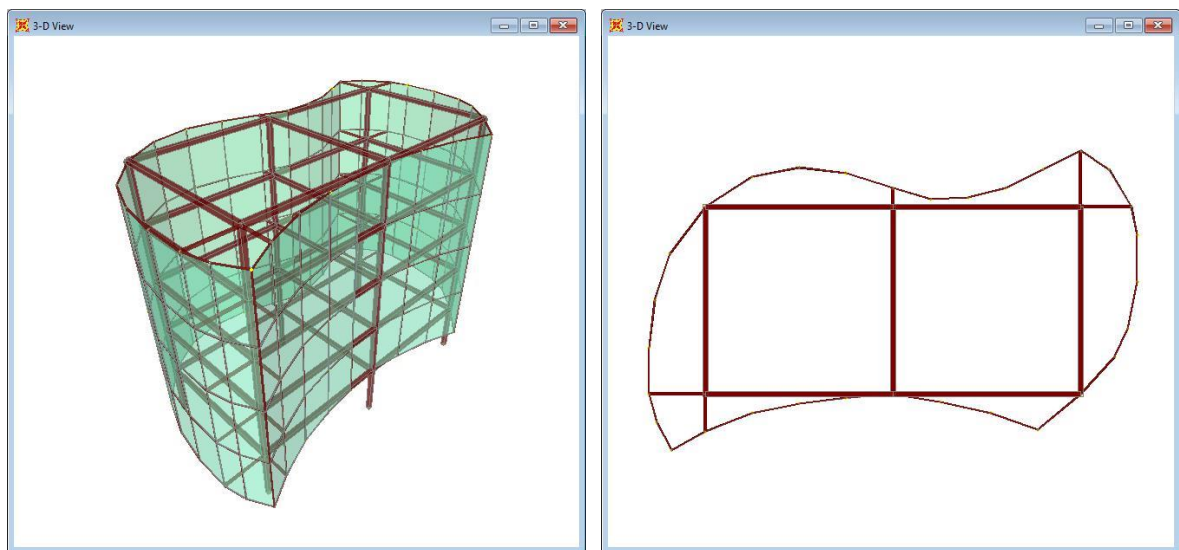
Numerical model of S-shaped (Sinuous shape) curtain walled building
